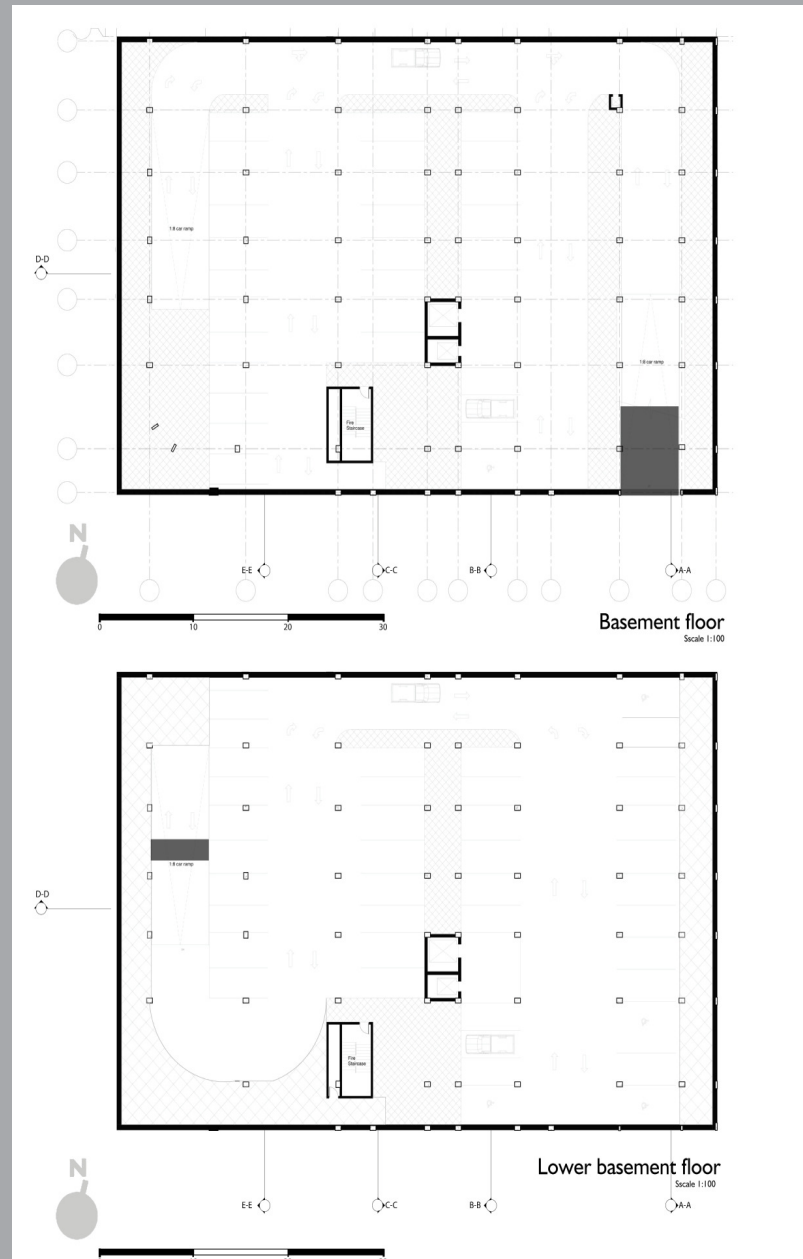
Showing the Basement Floor Plan Source Author , 2020
